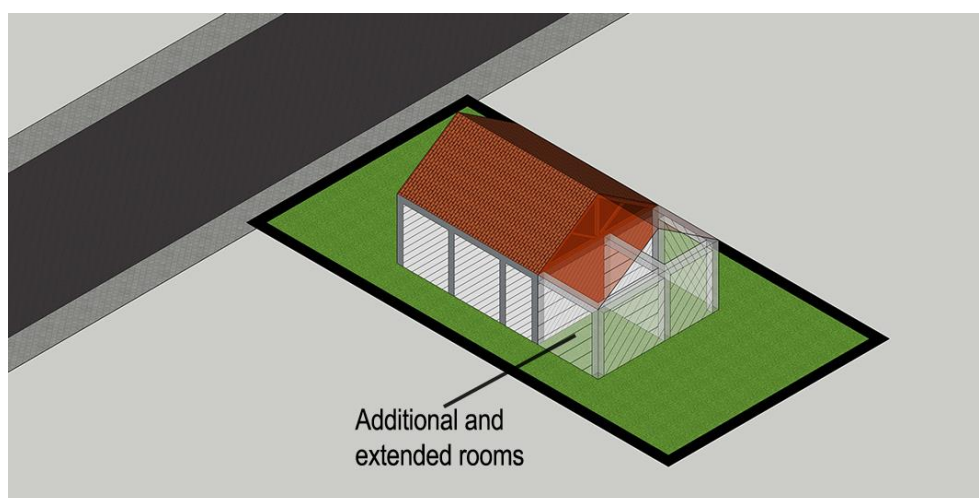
Indicative possible addition and extension to structural framework and infill wall houses.
